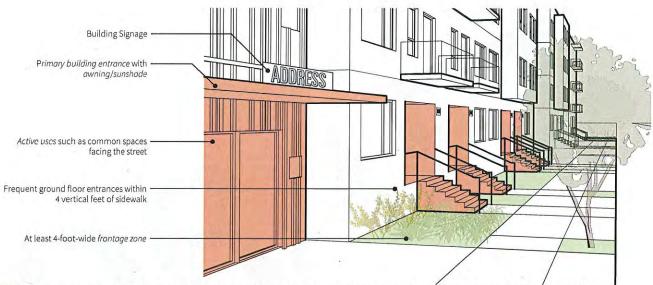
Locate residential entrances and active uses such as gyms and community spaces on street frontages. Frontage zones create the opportunity to provide stoops for raised residential units and protect pedestrians from any doors opening out to the sidewalk.
